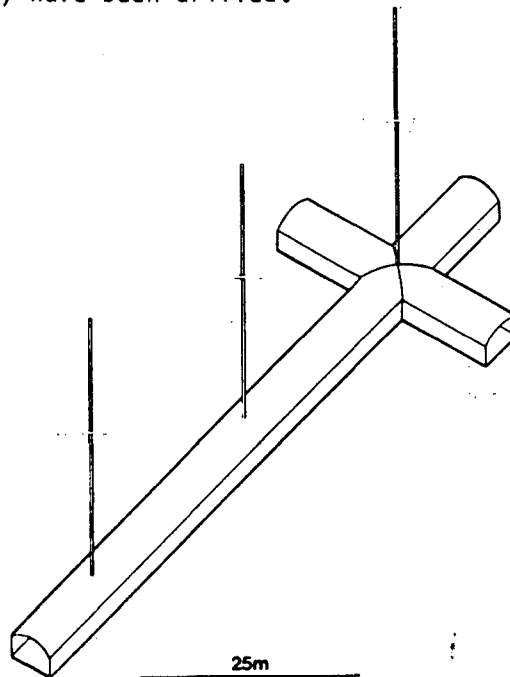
Layout of the 3-D test site with 3 vertical injection holes.
